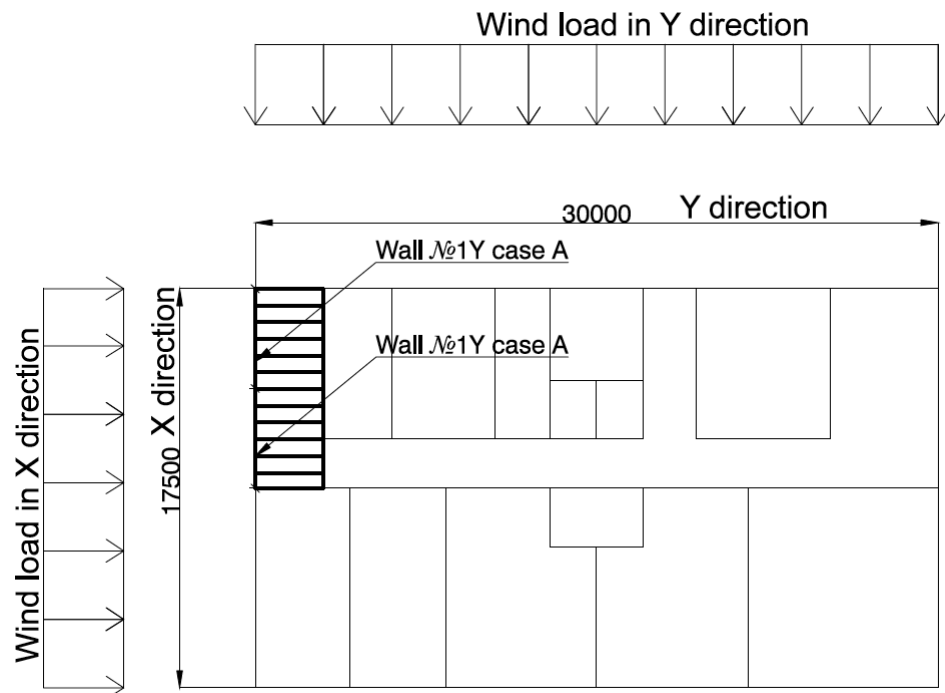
Schematic plan view of the building. Calculation of the forces, which are acting on the wall №1Y case A
